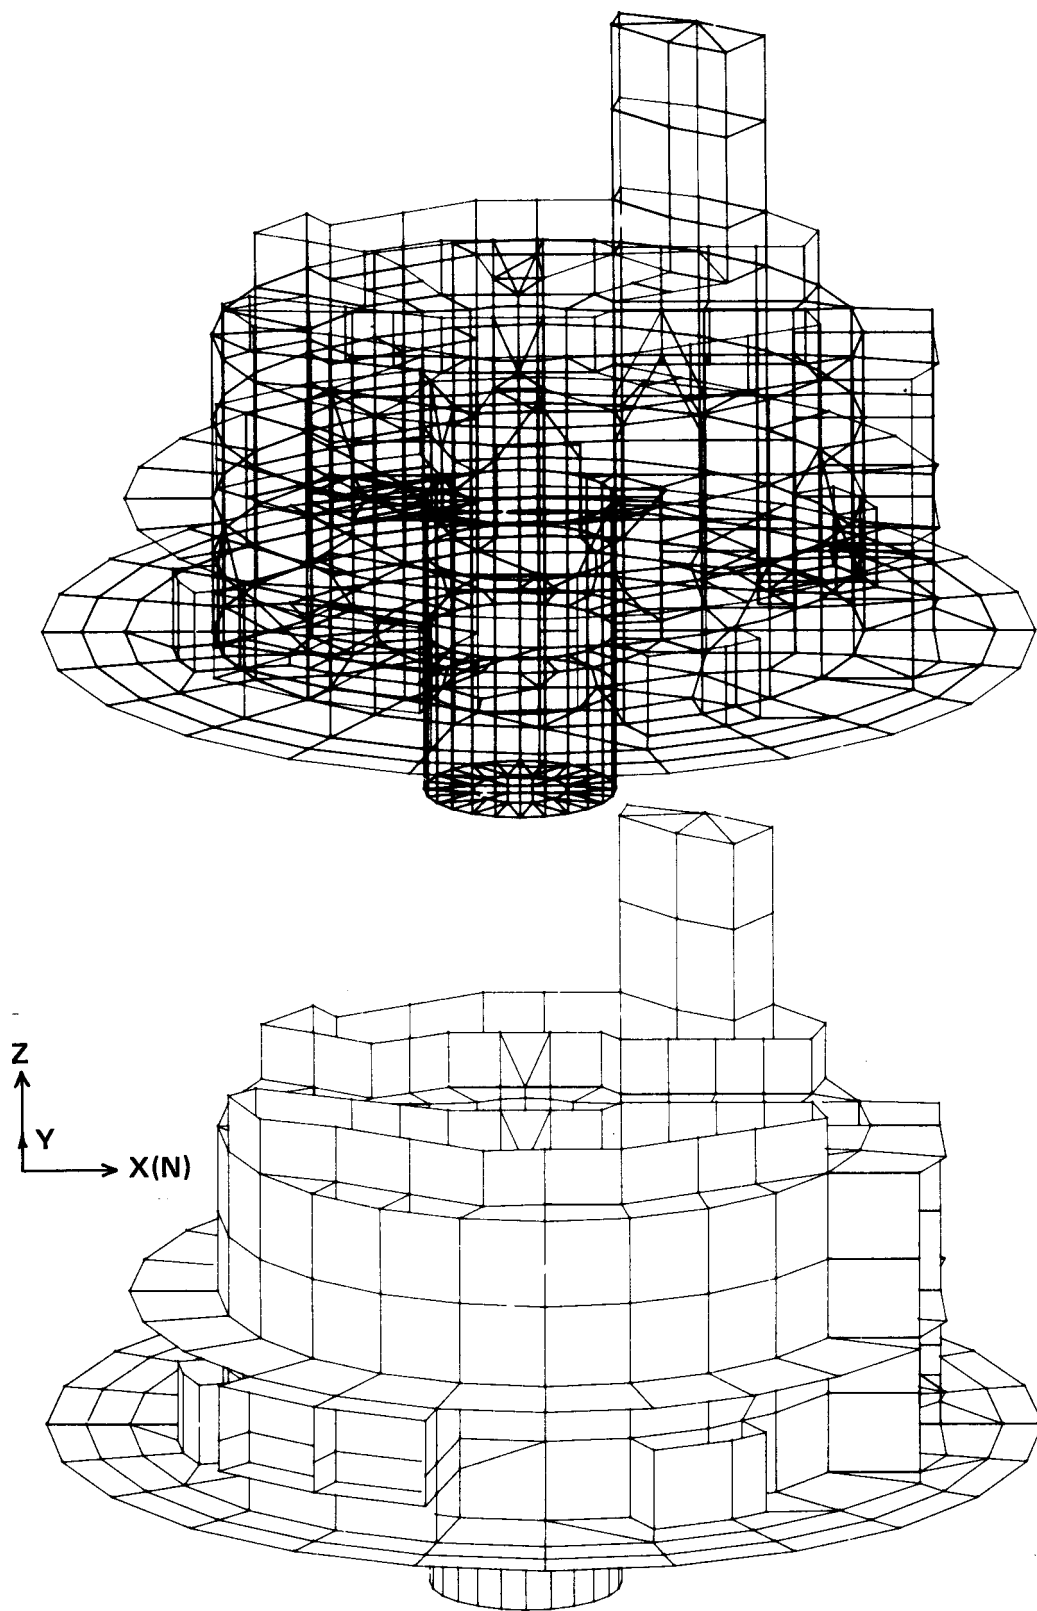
A perspective view of the three-dimensional finite element model for the internal concrete structure in the containment building at Zion.
